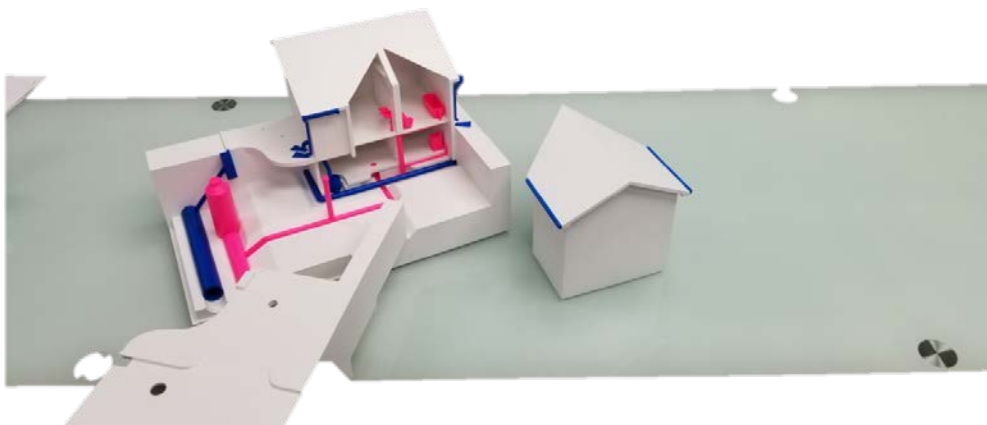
3D Printed Model used to Demonstrate Proper Pipe Connections
